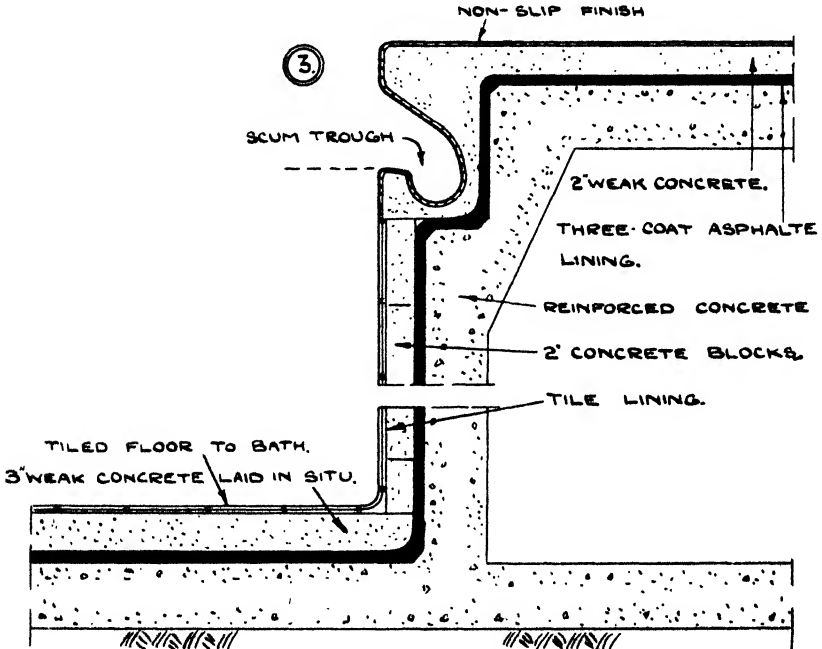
ALTERNATIVE FINISH TO FLOOR OF SWIMMING POOL
